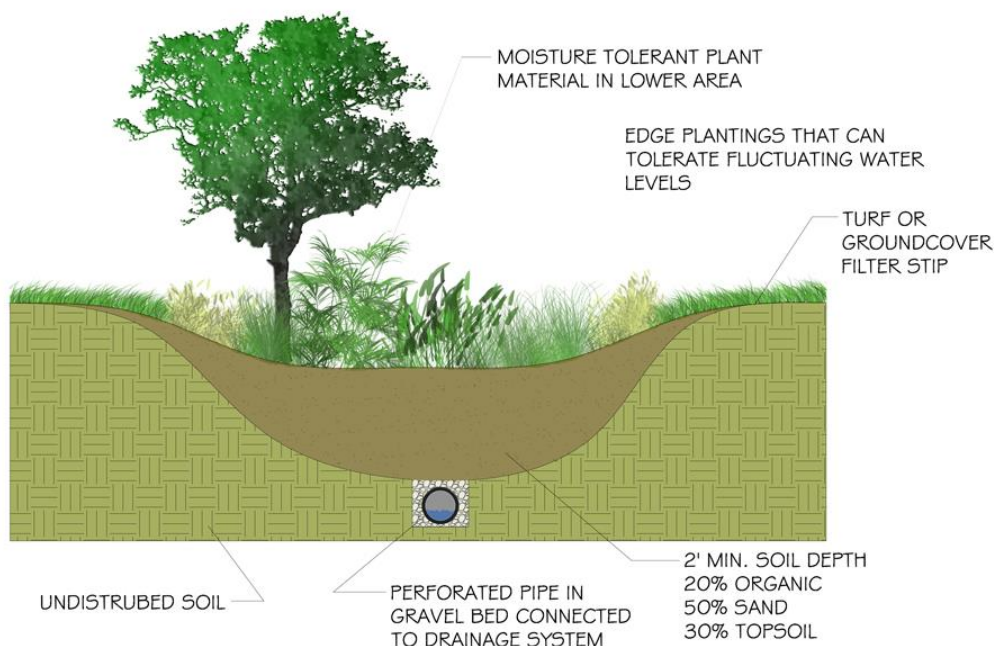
Section of a Rain Garden(Abbey,2009).
